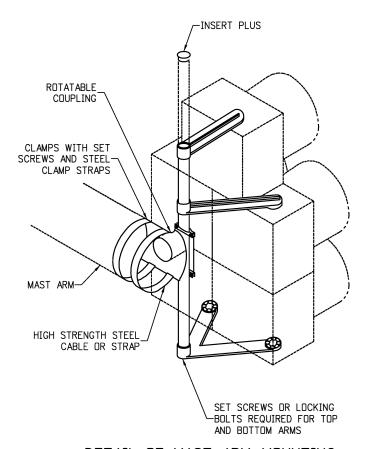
DETAIL OF MAST ARM MOUNTING FOR IN-LINE SIGNAL HEAD (3-SECTION, 4-SECTION OR 5-SECTION)
